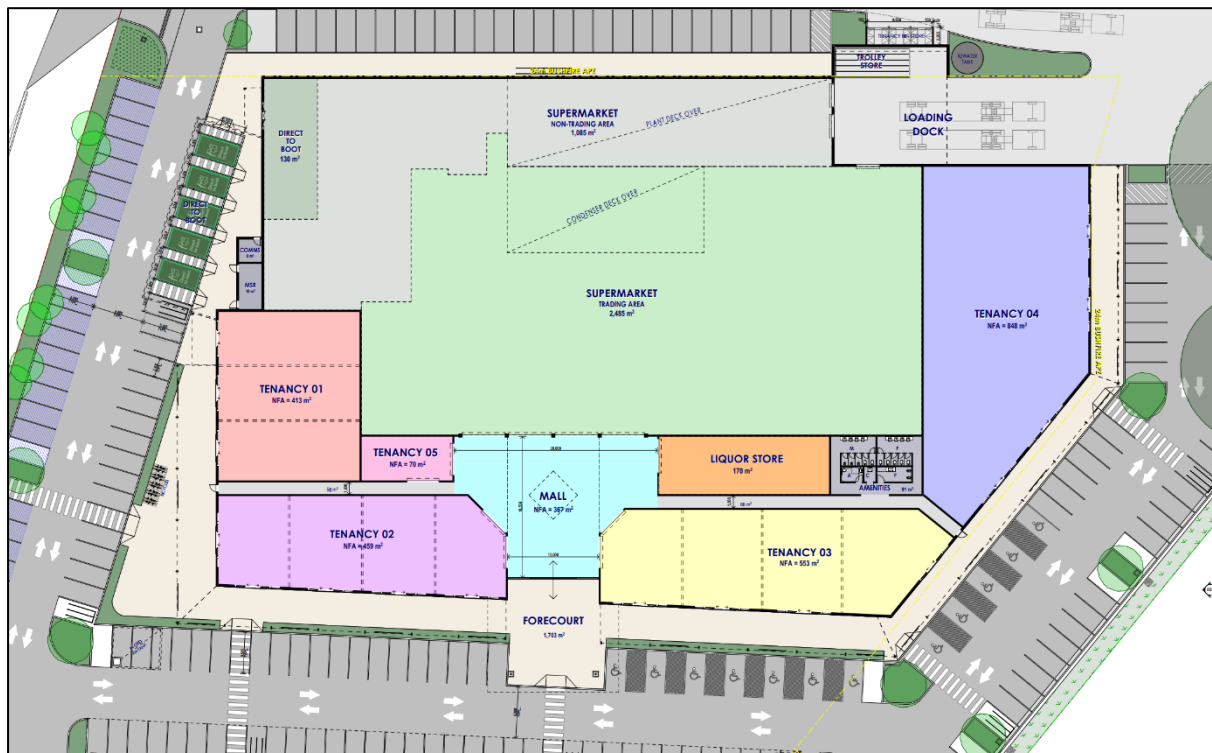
Ground Floor Plan (Prepared by *EJE Architecture* – A05 – 27/06/2024 - rev. C)
